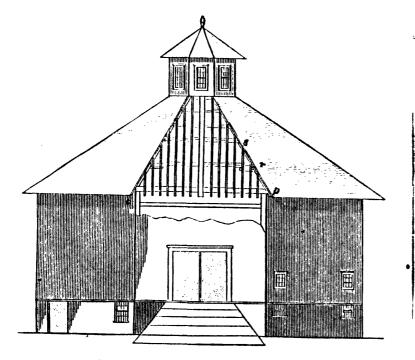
OCTAGON BARN (NORTH ELEVATION).
